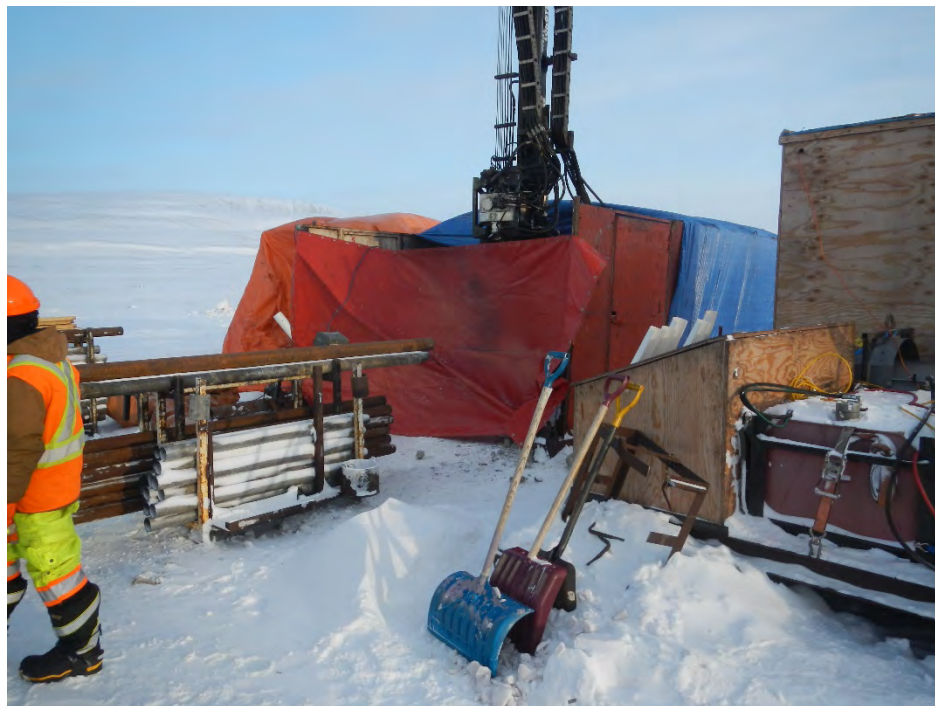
Drilling Conditions at BH18-BR15-2, April 2018
